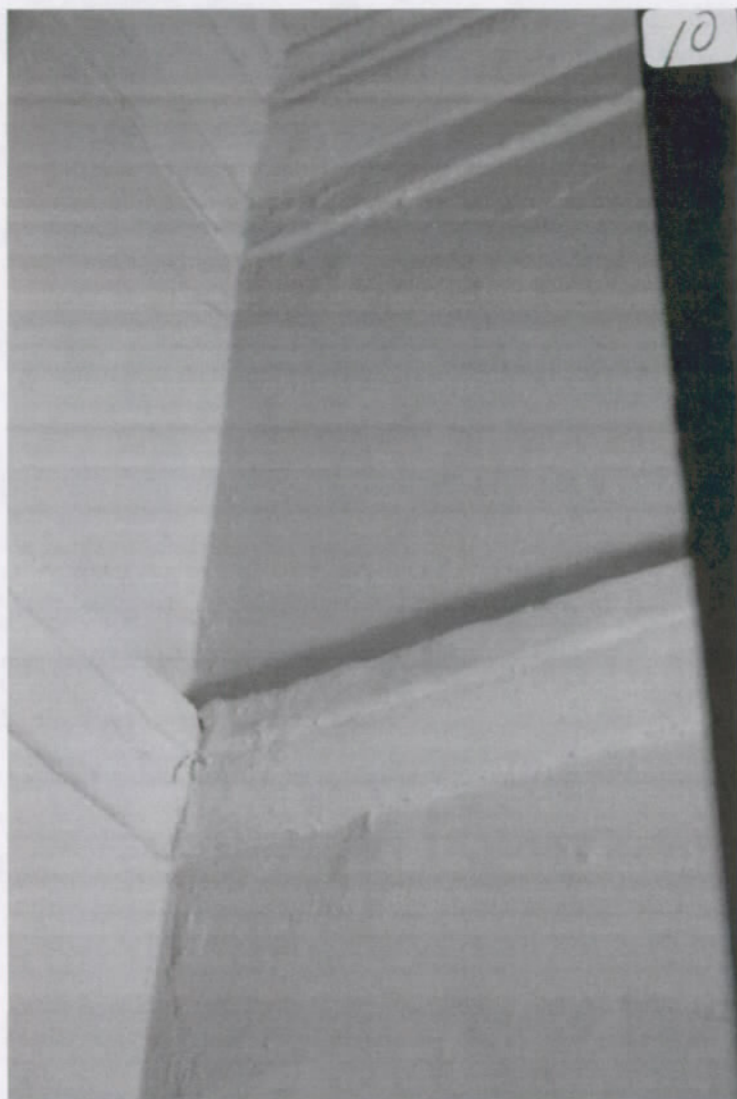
Poor plaster repairs of mouldings in northwest corner.
